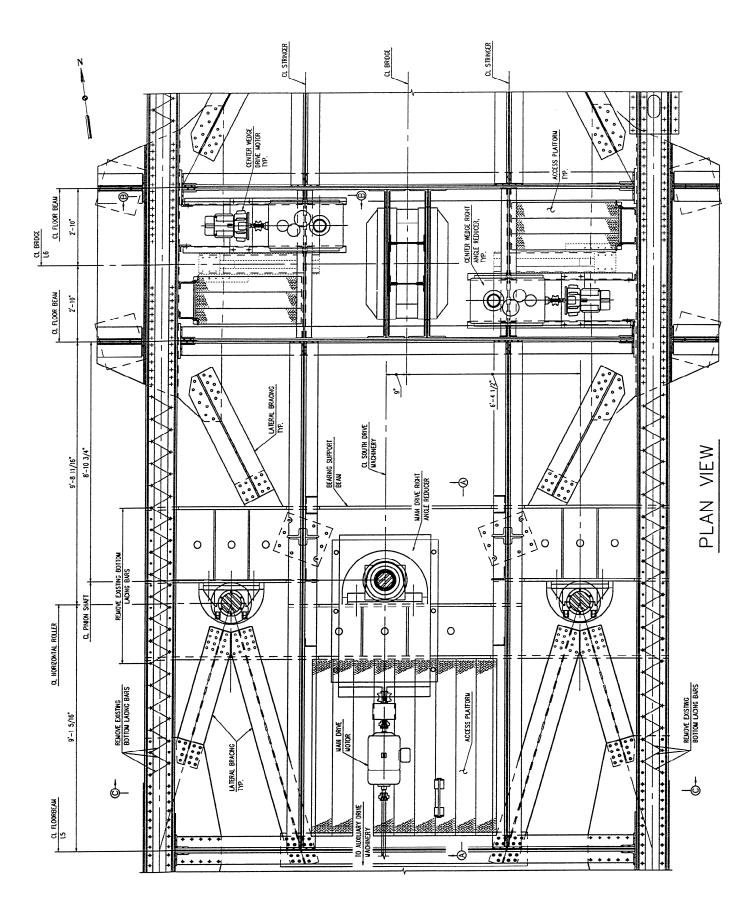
Plan View of the Main Drive Turning Machinery, the Center Wedge Drive Machinery and the Bearing Support Beam
